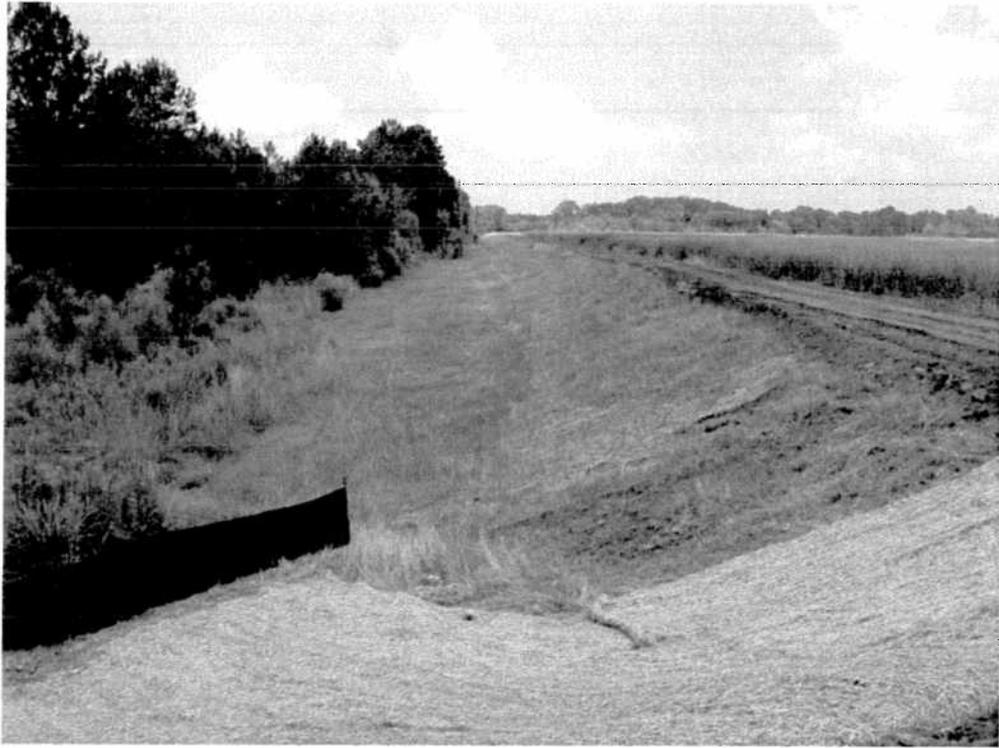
Bank of New Pond Section at SW Corner of Ash Pond
